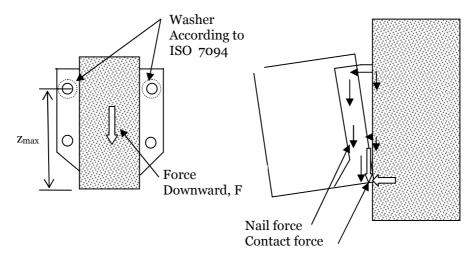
Left: Cross section in joist. Right: The joist will deflect and rotate, at the bottom a contact force will occur at the bottom plate, and the withdrawal forces in the bolts in the wall will vary linearly as assumed for nailed connections in the header.
